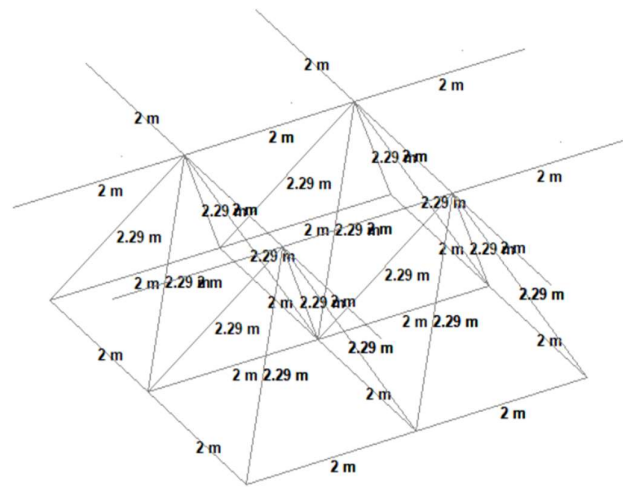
A Part View of Space Frame Joining Top and Bottom Grid Members.
